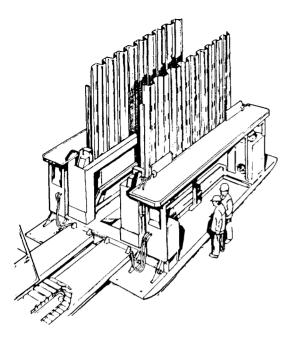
Proprietary rail-mounted piling frame. (This figure is reproduced by courtesy of the Construction Industry Research and Information Association, Technical Note 95 *Proprietary trench support systems*)
